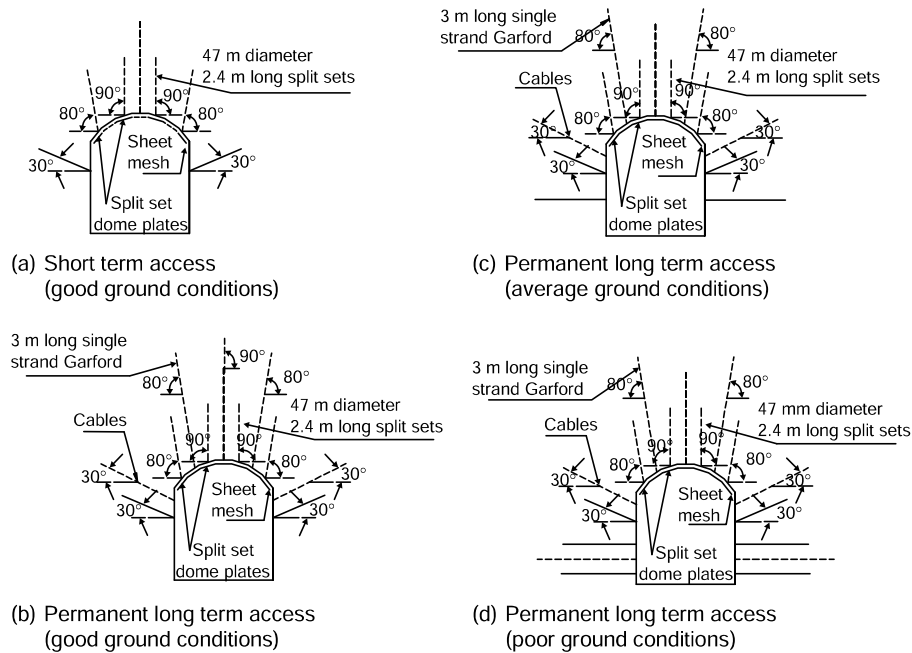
Application of split set dome plates, split set (rock bolts), sheet mesh and cables (strand Graford) at Mount Isa Mines for good and poor ground conditions prevalent for the long term and short term accesses Excavation size  $4\text{ m} \times 4.7\text{ m}$ . Max. bolt spacing = 1.2 m; Ring spacing = 1.4–1.5 m. Cable bolt ring spacing 2.5 m; Tension 3–5 tons. Sheet mesh = (100 mm  $\times$  100 mm  $\times$  5 mm). Courtesy: Mount Isa Mines, Australia.
